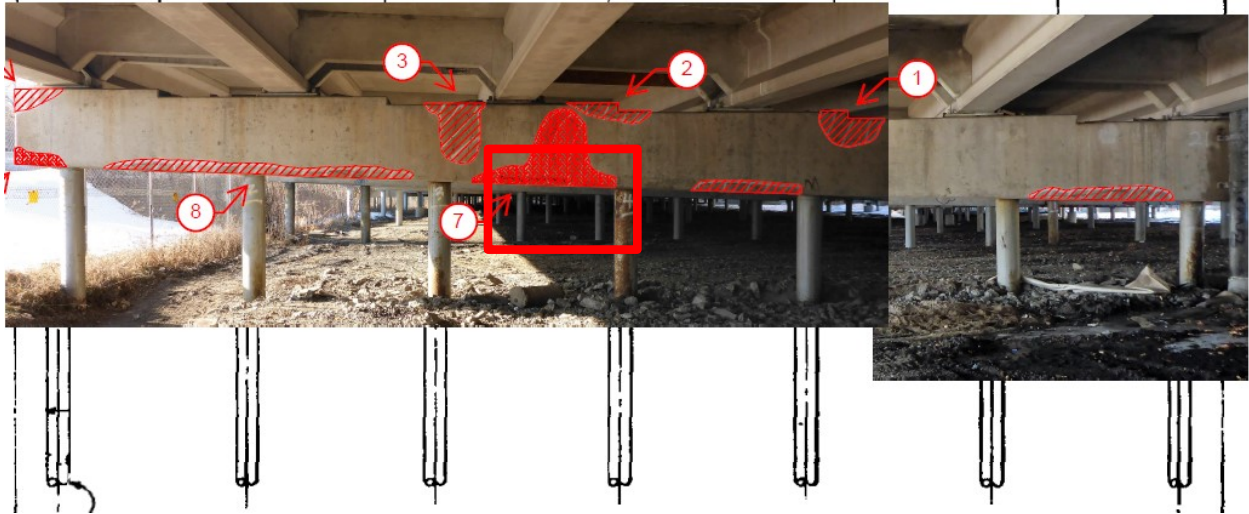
Pier 21EB mapping diagrams (east face, photo taken in 2018)
